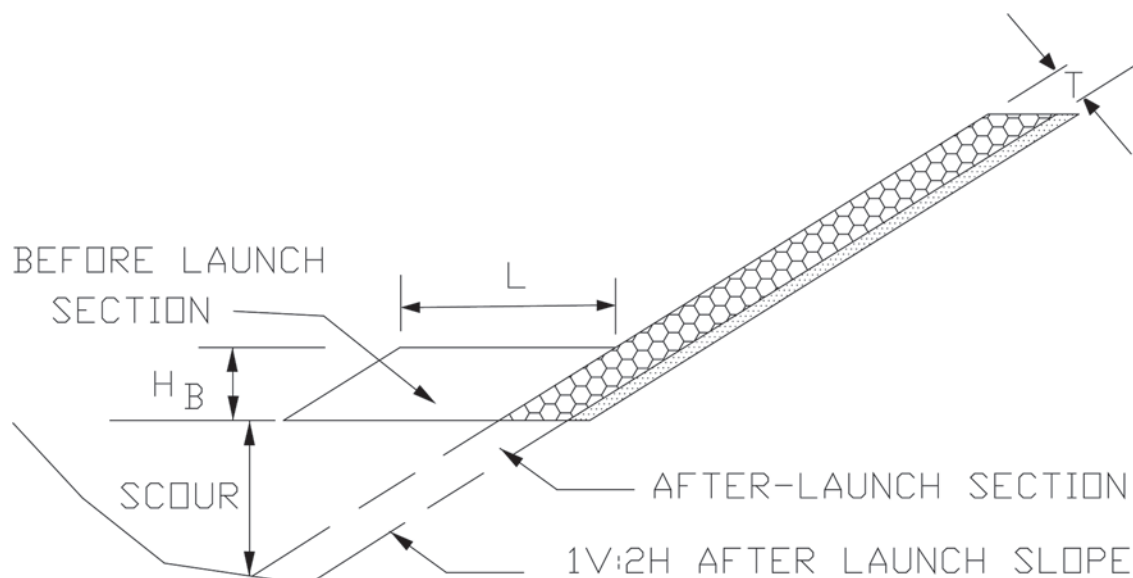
Launched stone schematic. Before launch section can be placed above, on, or below streambed. Developed by author.
